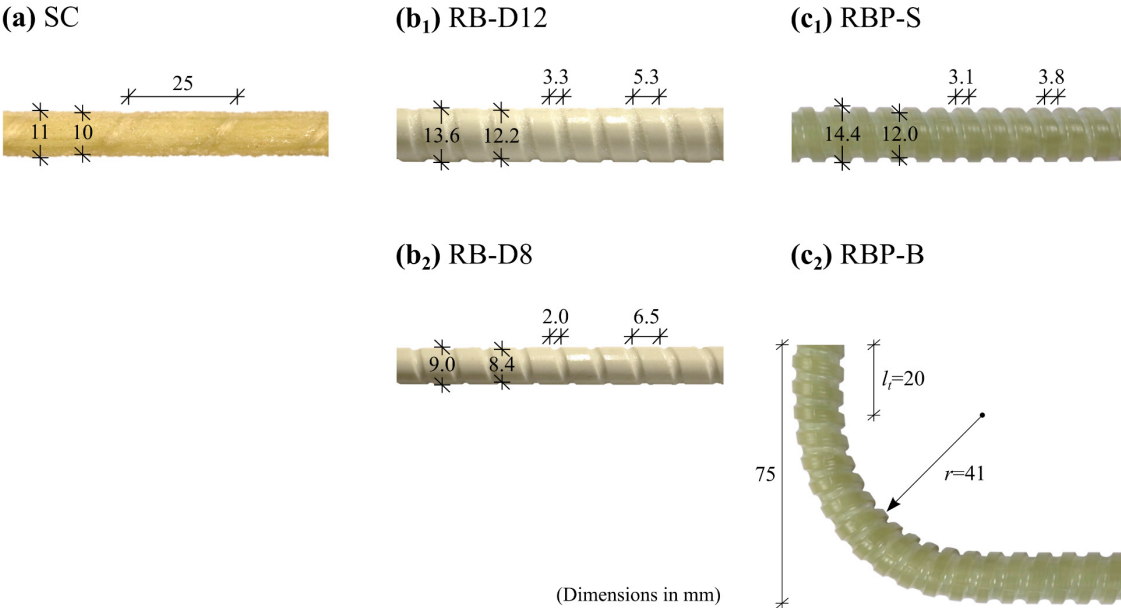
GFRP reinforcing bars tested (dimensions in mm).
